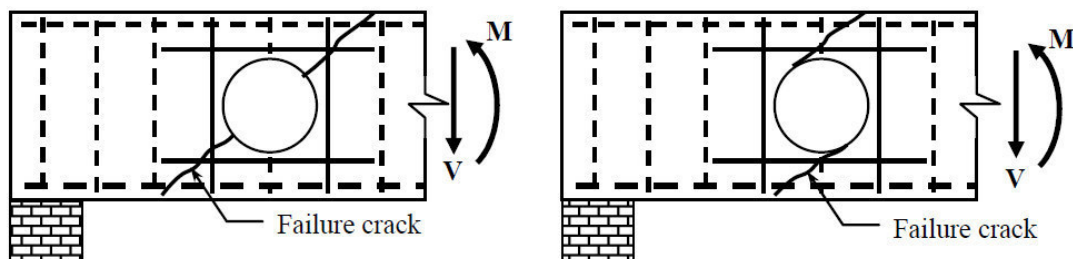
Two modes of shear failure of small openings. Left: beam type failure, Right: Frame type failure [Mansur (2005)]
